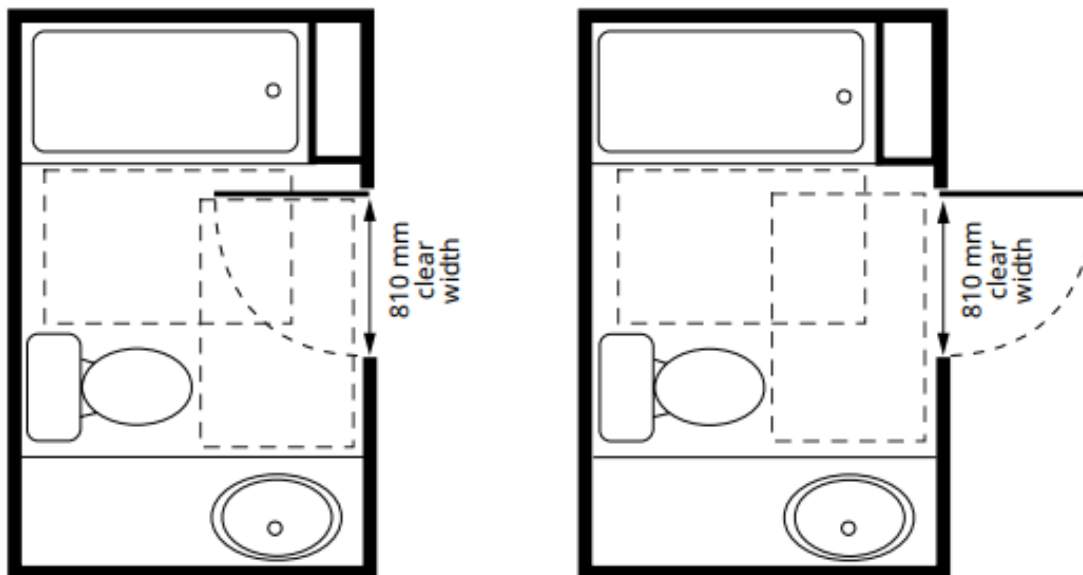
Typical Residential Occupancy Washrooms in Plan View
